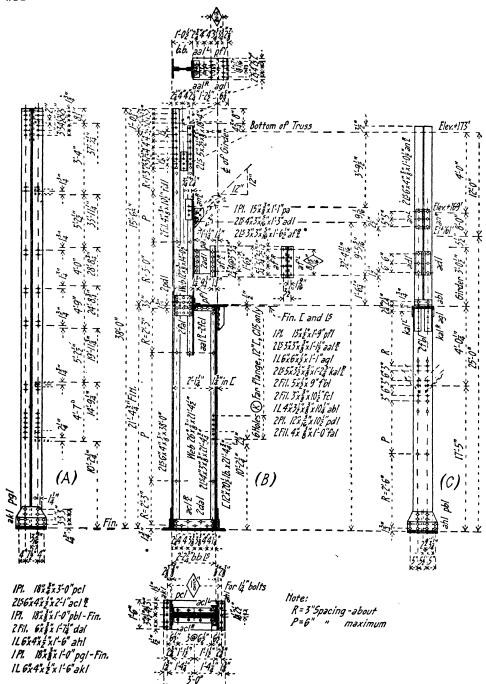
DETAILS OF COLUMN. AMERICAN BRIDGE COMPANY.
